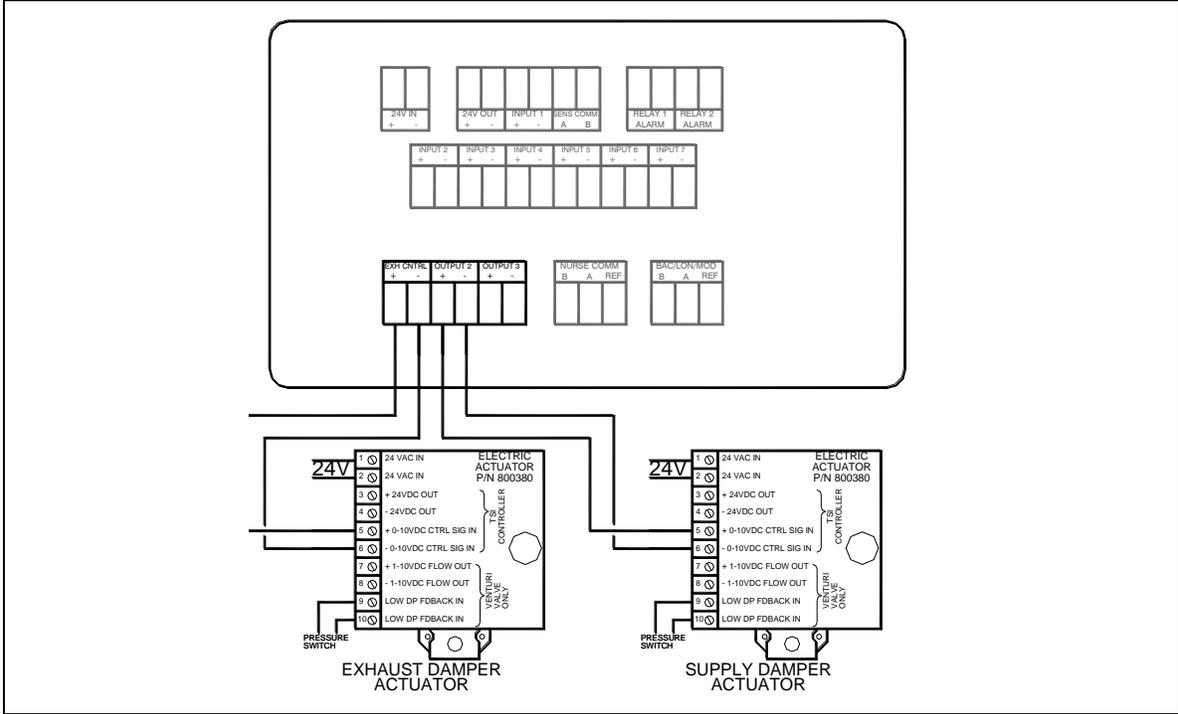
Optional Supply & Exhaust Actuator Wiring to Model RPC30
